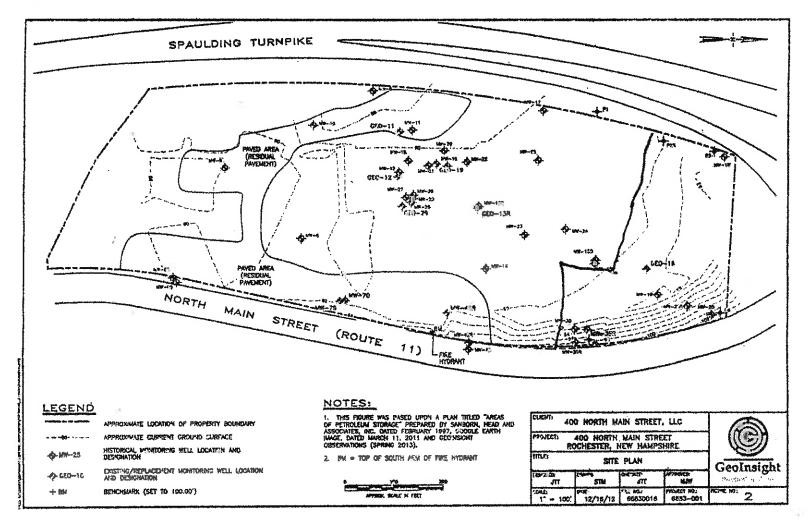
# EXHIBIT H - SITE PLAN, SUBJECT PARCEL
